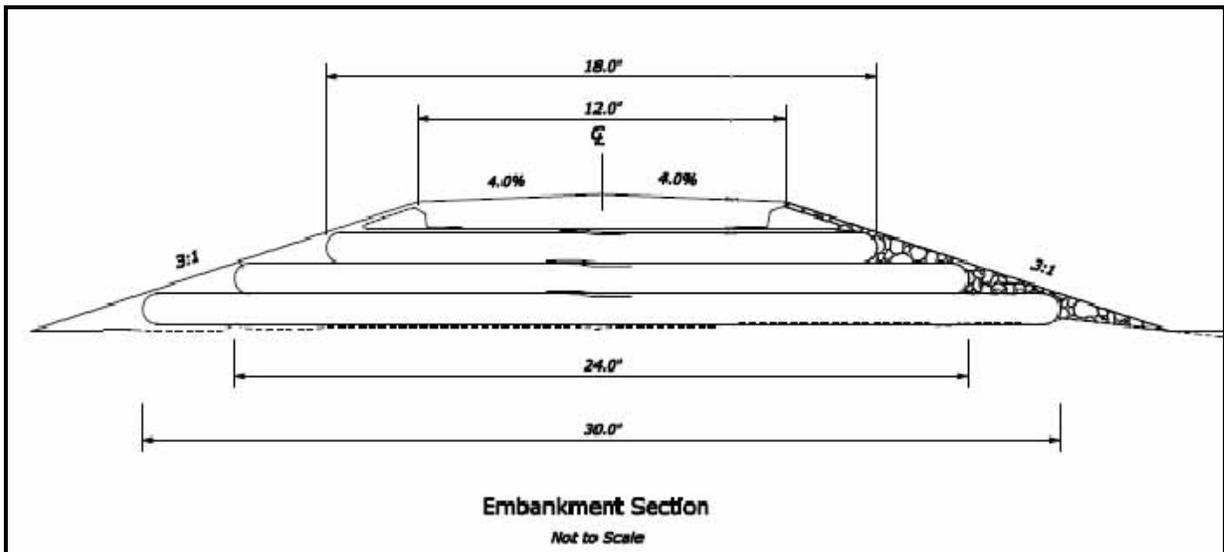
The embankment section would be used in the portion of the roadway along the West End Salt Pond that is currently experiencing flooding.
